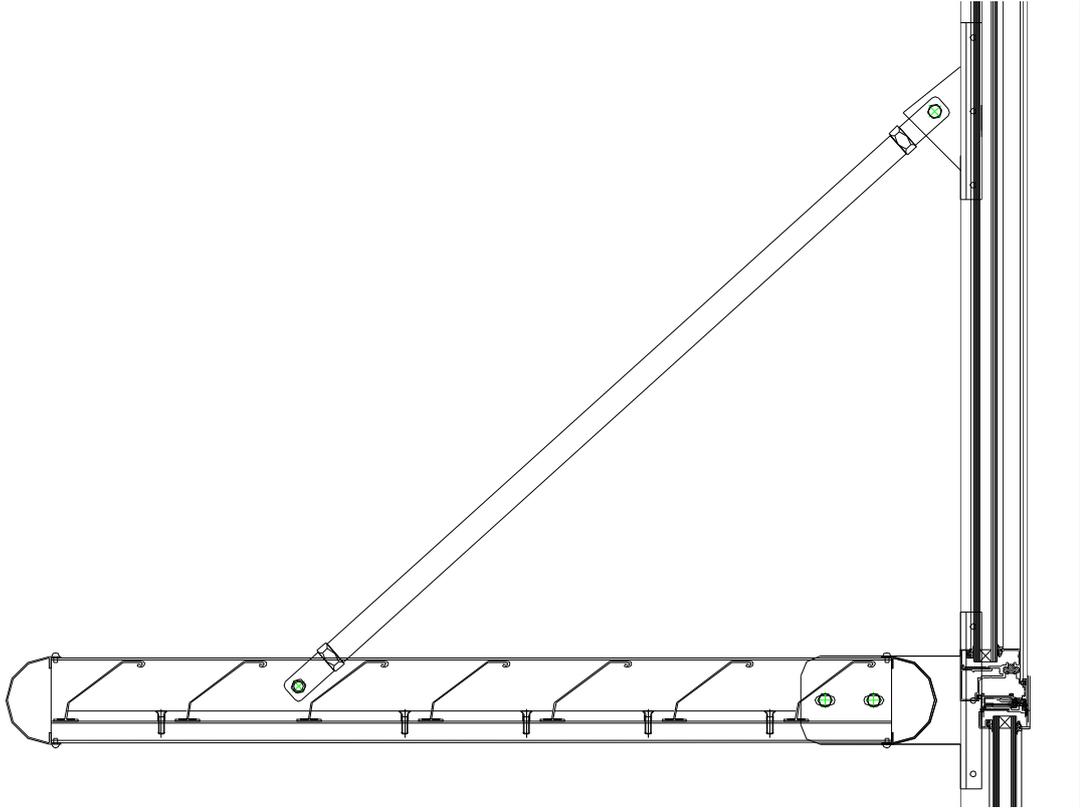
Typical Horizontal Braced Brise Soleil Installation
